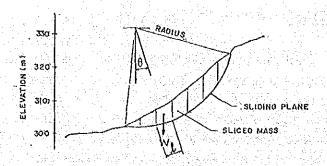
STABILITY CALCULATION (CIRCULAR RAPTURE PLANE)
